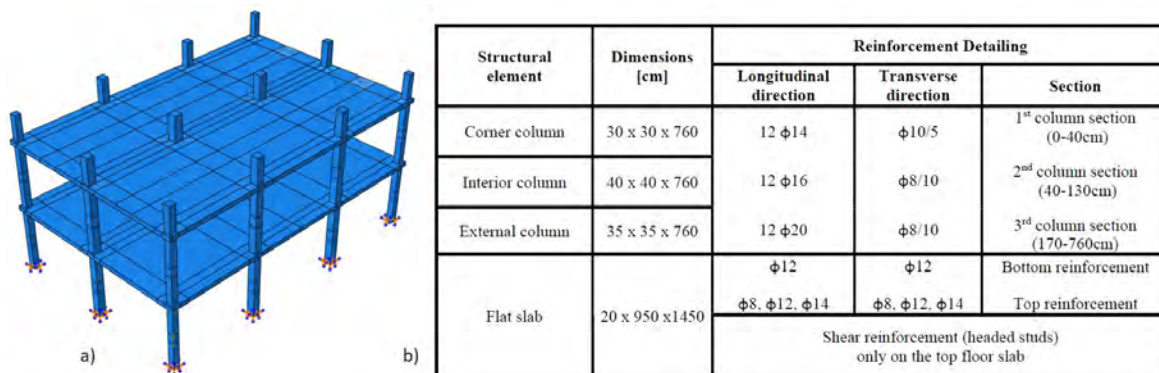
a) 3D numerical model; b) Dimensions and reinforcement details of structural elements
